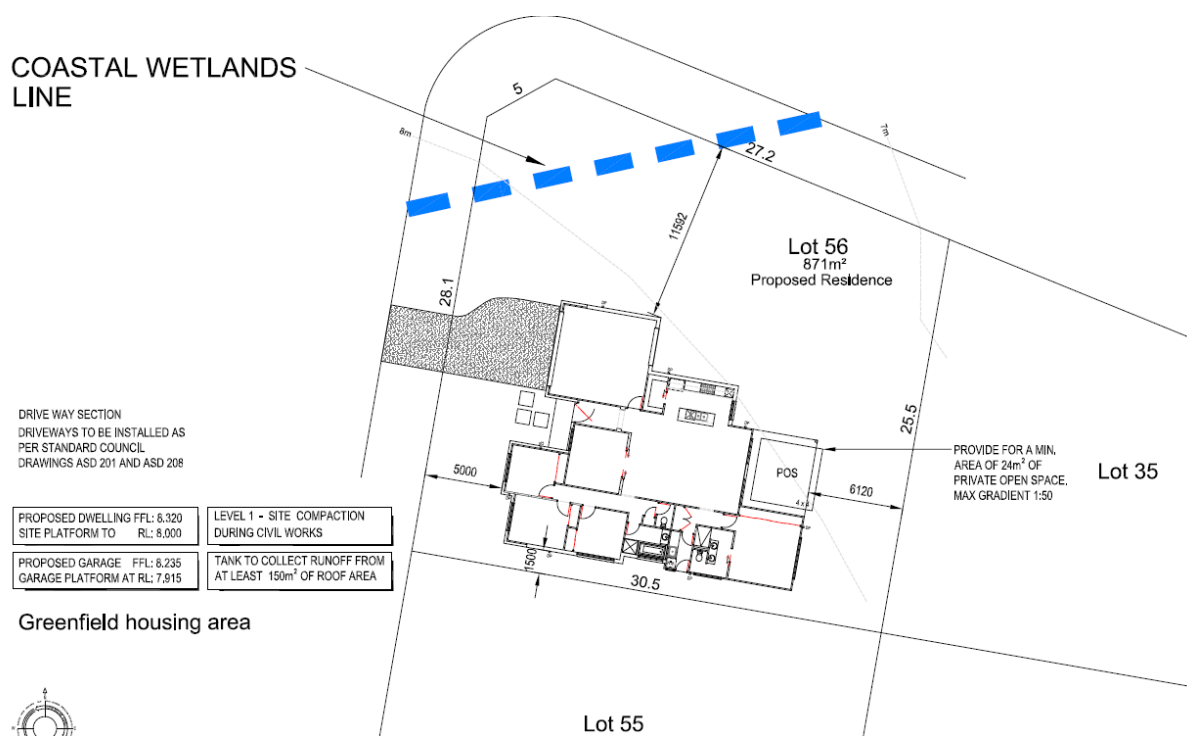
Extract of site plan showing the single dwelling layout on proposed Lot 56
